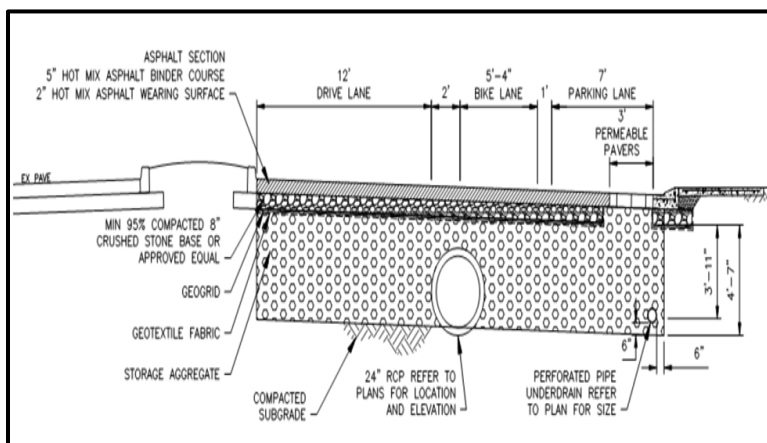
Cross-Section of Pervious Pavement with Subsurface Storage
